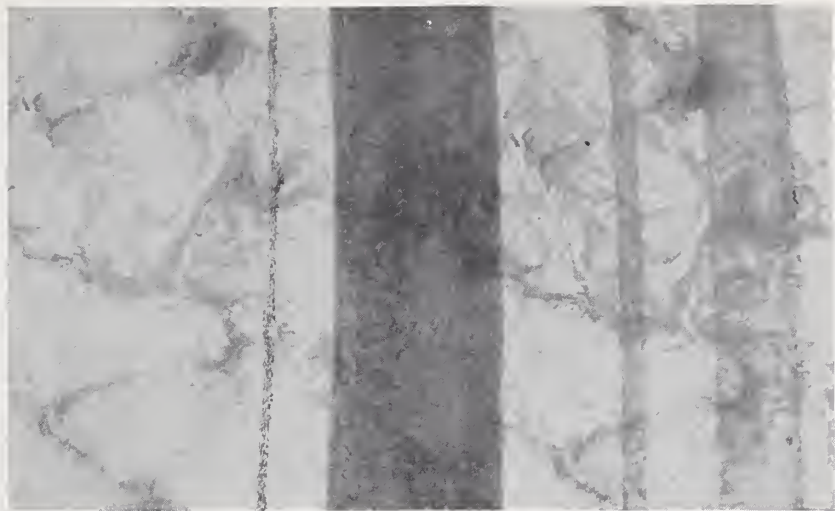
$\frac{5}{64}$ -in. felt base, resin treated cotton linters sheet wearing surface, on plywood subfloor (test panel 8R).
